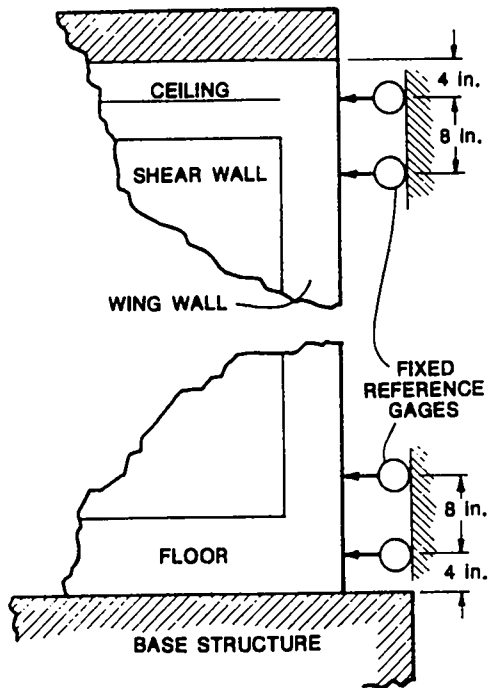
Gage location for measurement of floor and ceiling motion relative to the shear wall.
